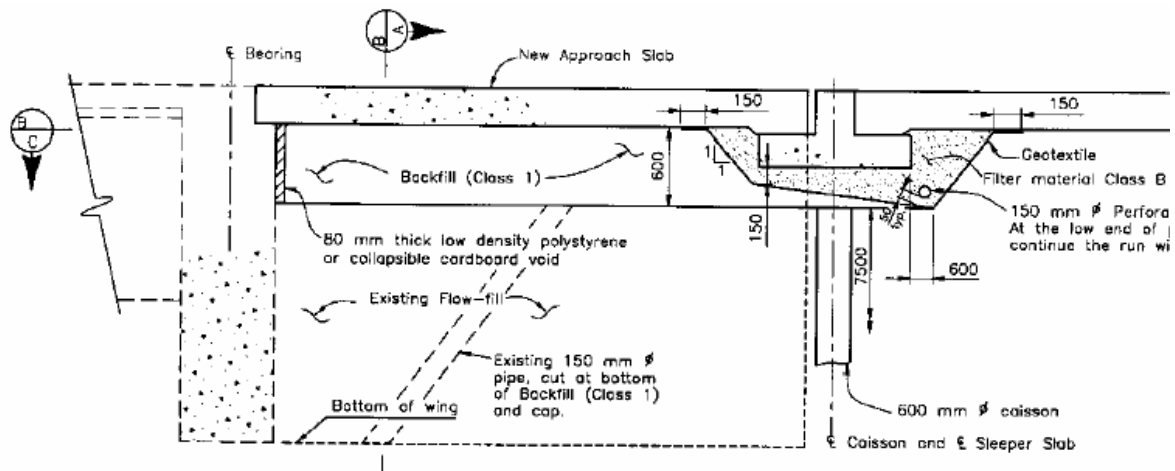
Use of Caissons in the Repair of the Bridge Approach Settlement Problem at Structure E-17-PQ.
